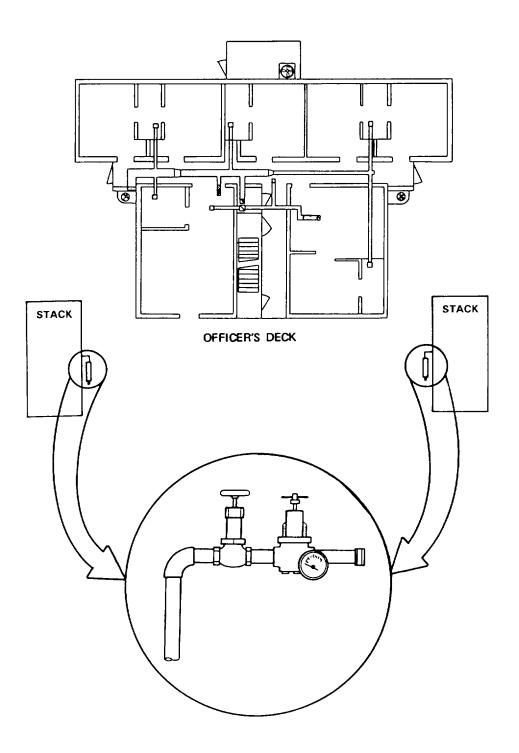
Compressed Air Piping System - Main Deck and Above (Sheet 4 of 6).
